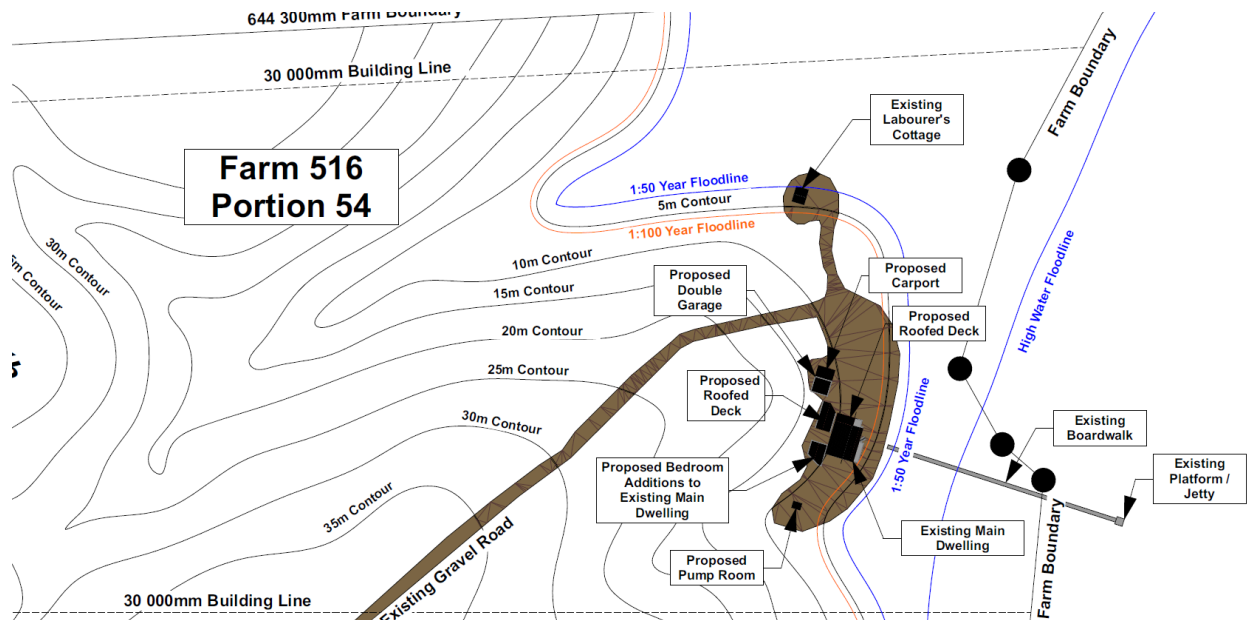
Enlarged section of the site layout plan, indicating existing cleared areas and proposed additions to the main dwelling.
